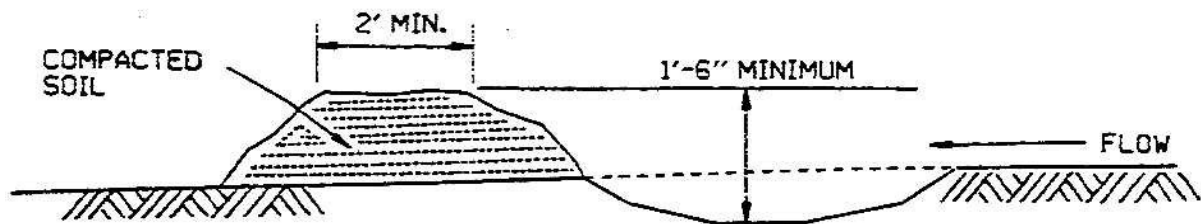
Swale configuration detail (Source: AHTD, 2001)
